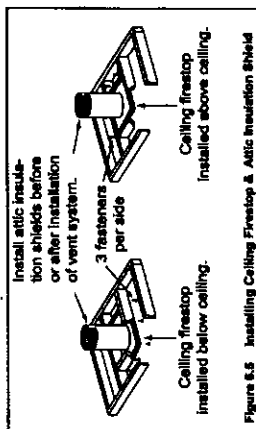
Installing Ceiling Firestop & Attic Insulation Shield
